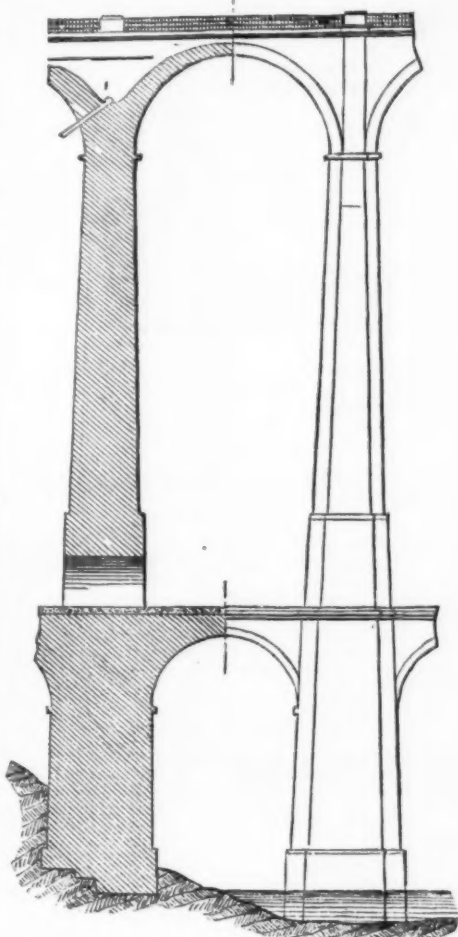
LONGITUDINAL ELEVATION AND SECTION OF TWO CONSECUTIVE PIERS.
